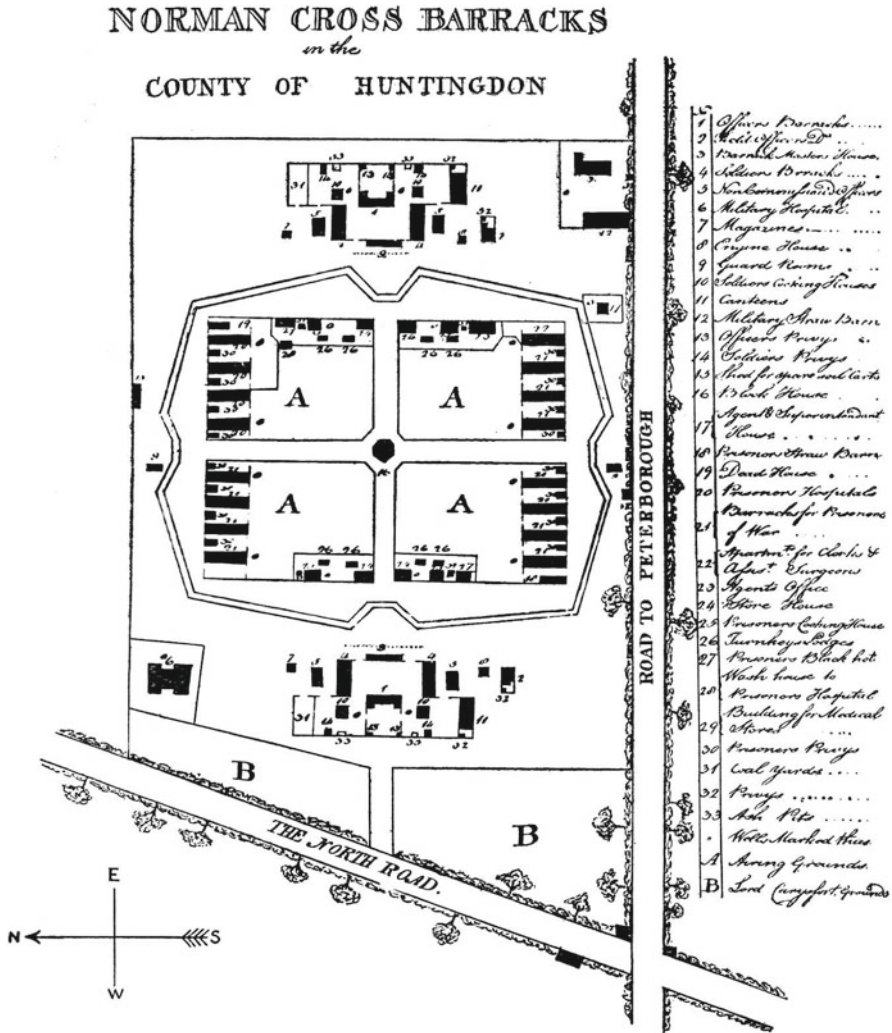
Plan of Norman Cross 1797–1803 by Hill; note schematic North to the left (after Walker 1913)
